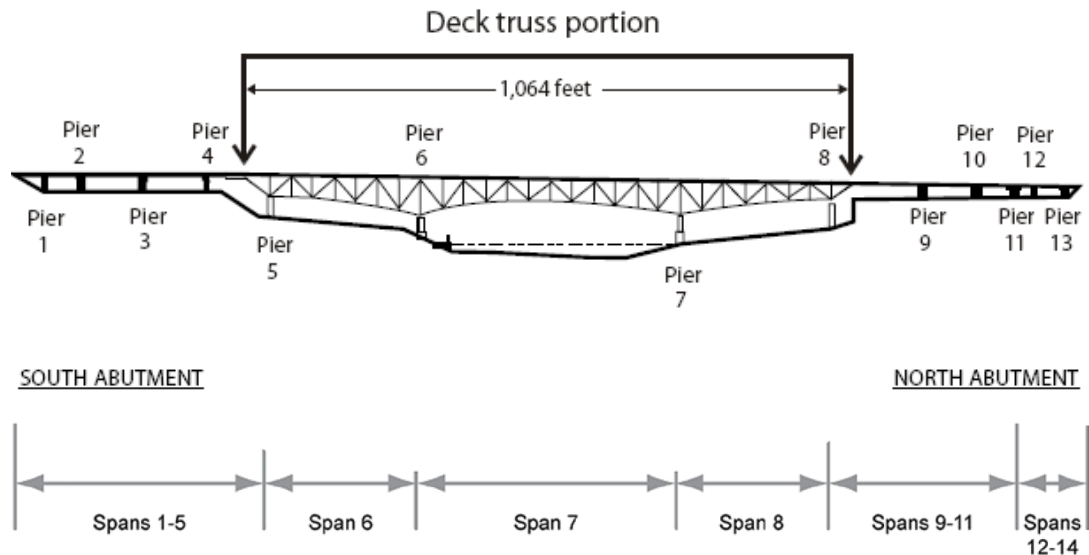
Elevation of the I-35W Bridge (NTSB, 2008b)
